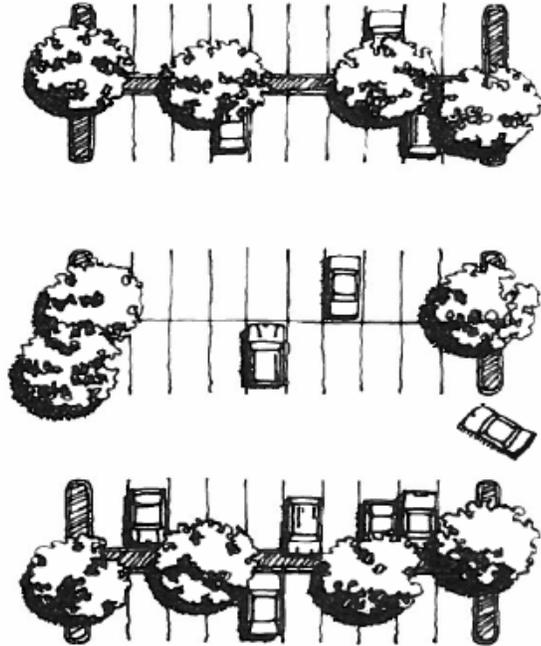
Parking blocks shall be separated from each other by landscaping, access drives or public streets, pedestrian walkways, or buildings.
